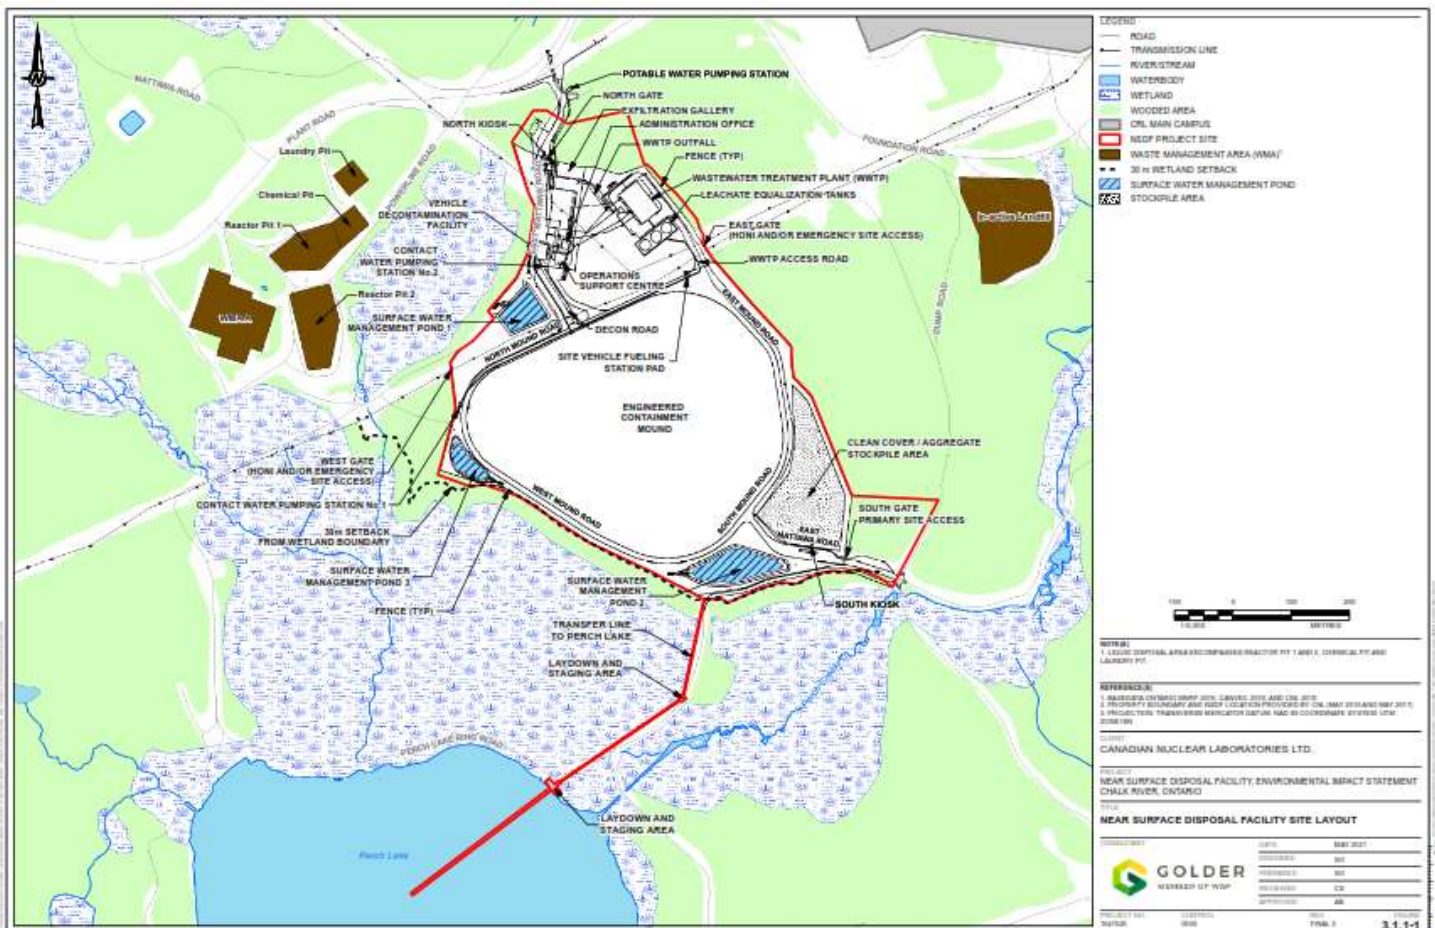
Facility Site Layout as Depicted in the CMD22-H7 Figures 2 and 10 [1]
